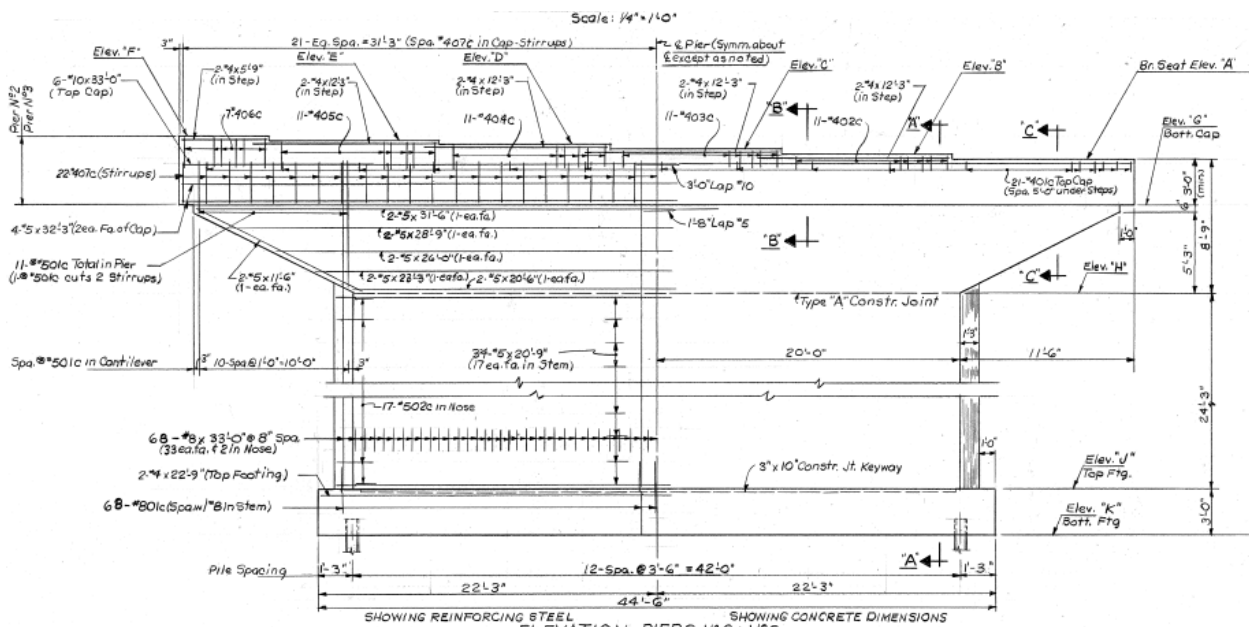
Transverse Elevation of Interior Pier (NBI 22240) (1989)
